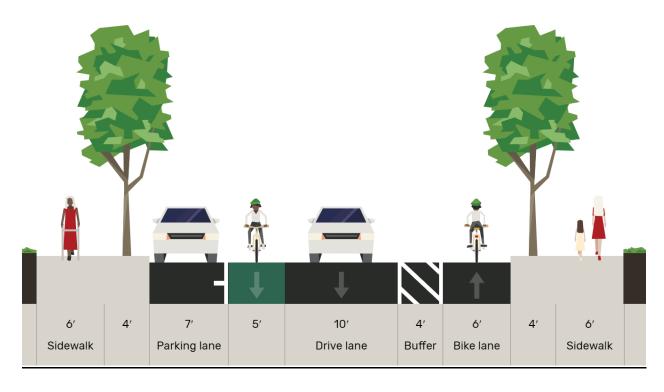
Cross Section of Existing Condition – 17<sup>th</sup> St NW from New Hampshire Ave to T St NW
